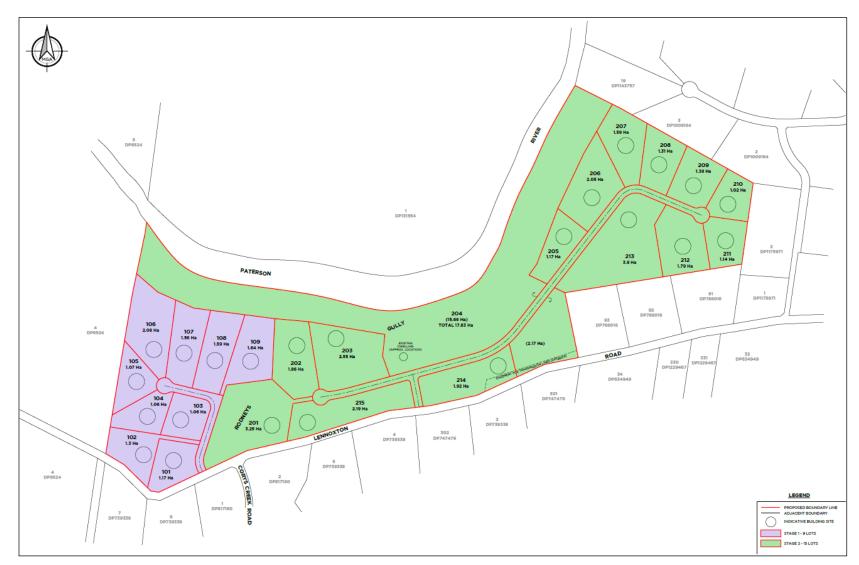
Staging Plan (Delfs Lascelles, 2024)
